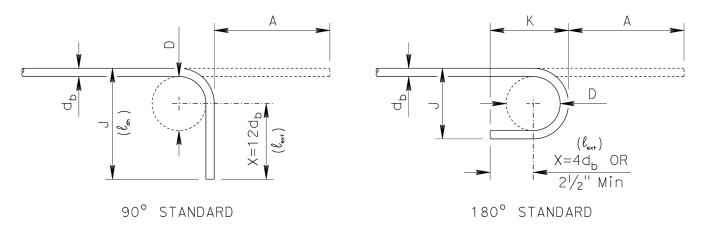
Hook and Bend Details for Primary Reinforcement
